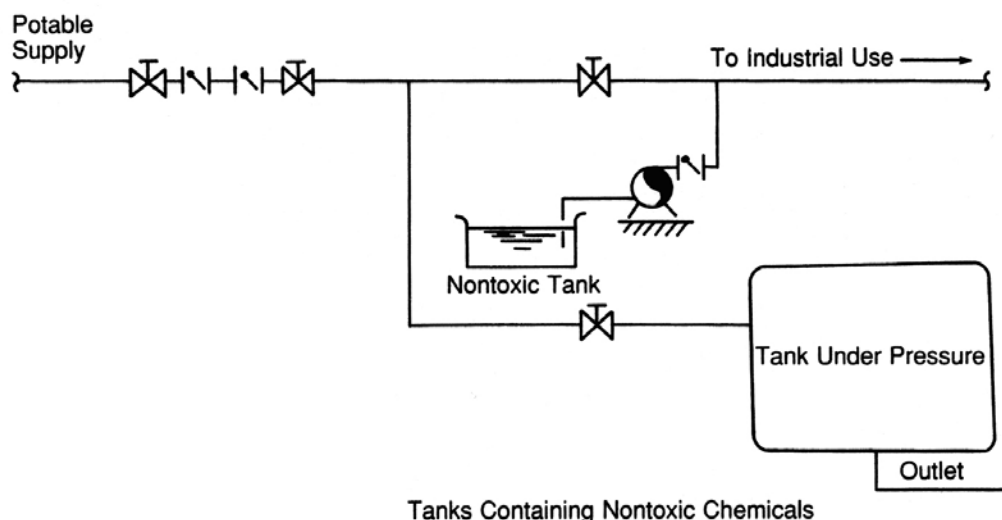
Typical Double Check Valve Assembly Application ⁶
